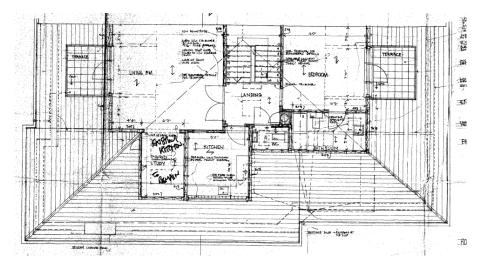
Approved layout with enlarged dormers and front and rear external terraces.
